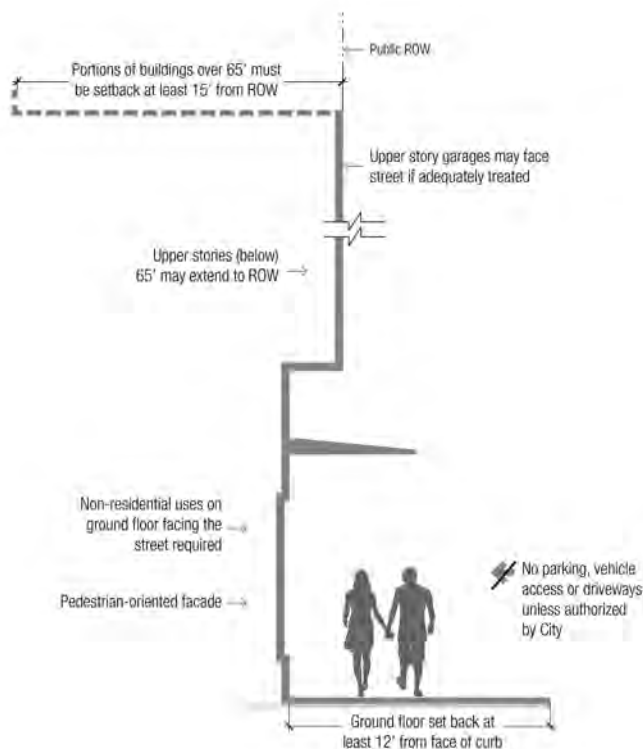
C.1: Summary of requirements for building facades facing a Type A Pedestrian Oriented Street. This diagram is for illustrative purposes only. See OMC 18.120.220.C for applicable requirements.
